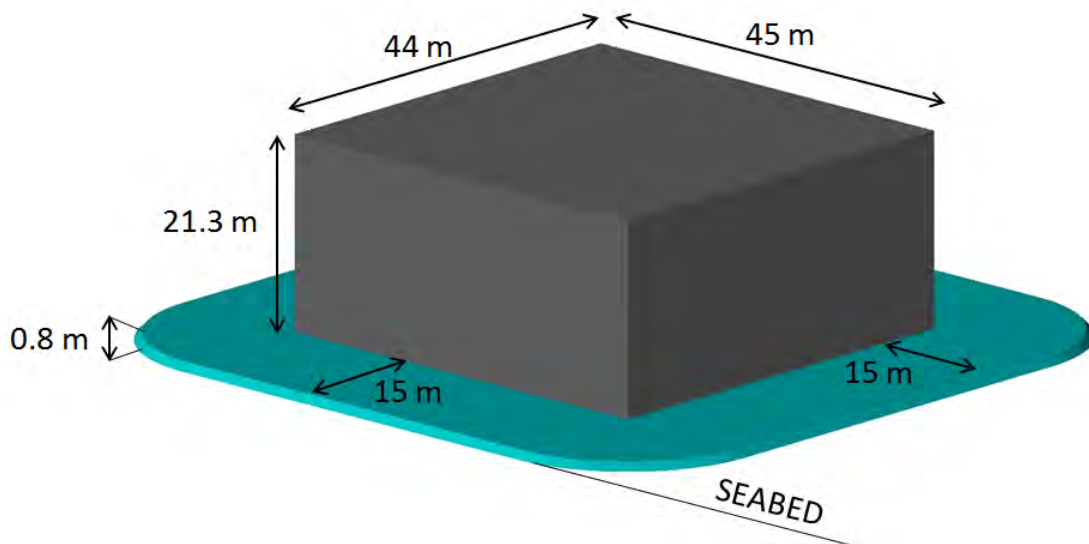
3D Rendering SW Anchor Block Scour Protection
